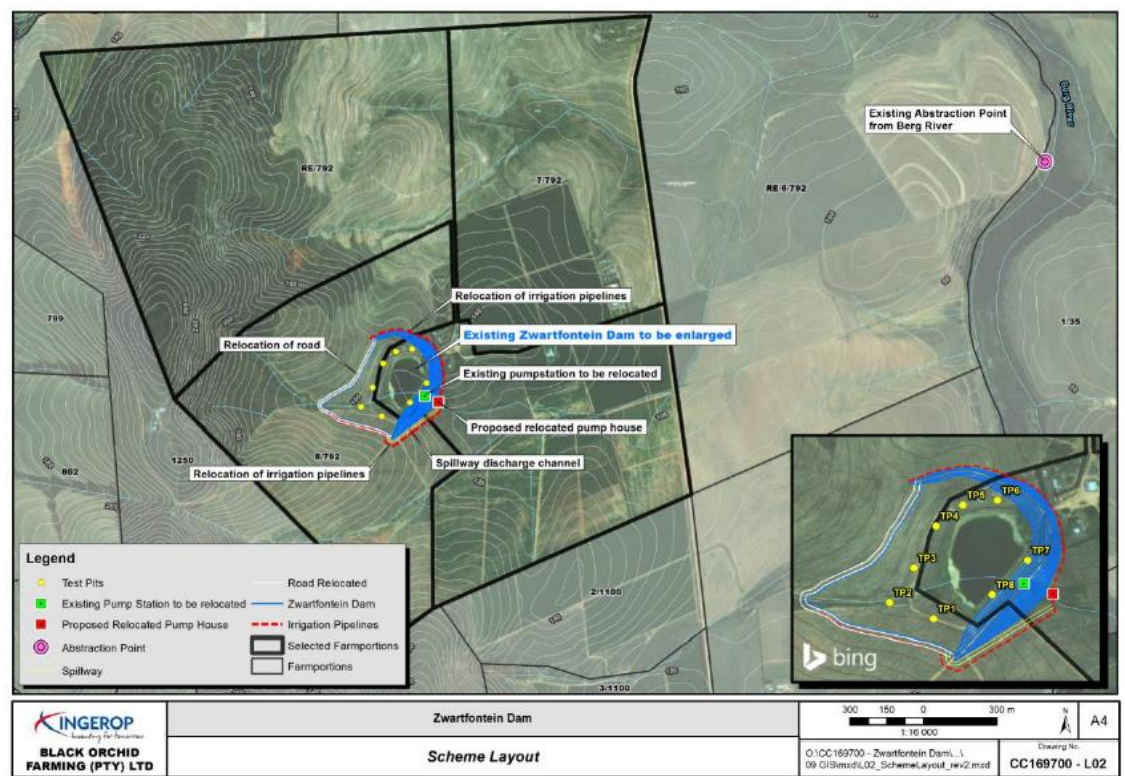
Site plan, Engineers Technical Report indicating the proposed and preferred relocation of dam infrastructure, Ingerop, 2019
